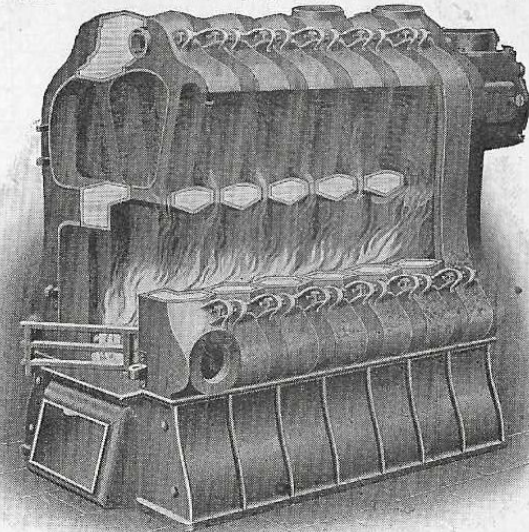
Sectional Elevation of "White Rose" Boiler.
